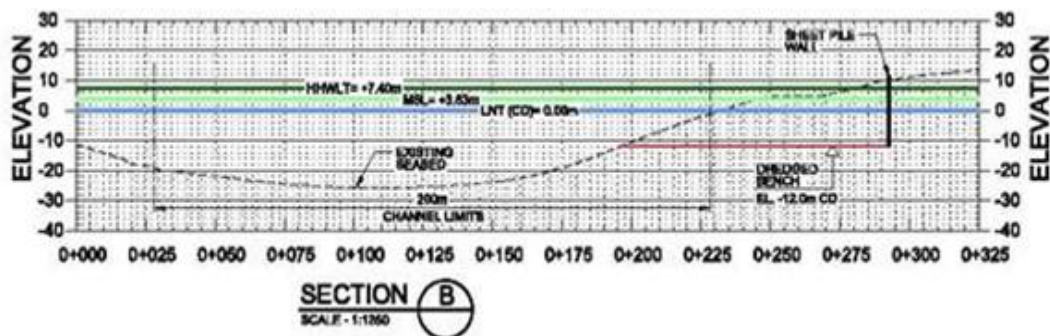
Cross-sections of Proposed Dredging Works at the MOF
